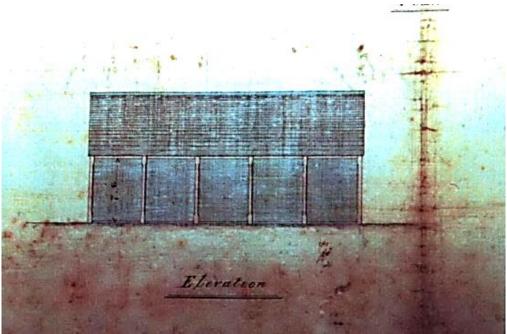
Orange Courthouse Barnet design 1881/3 – Detail Stables Elevation. Source: AONSW Plan 834 in Mider, 1998
